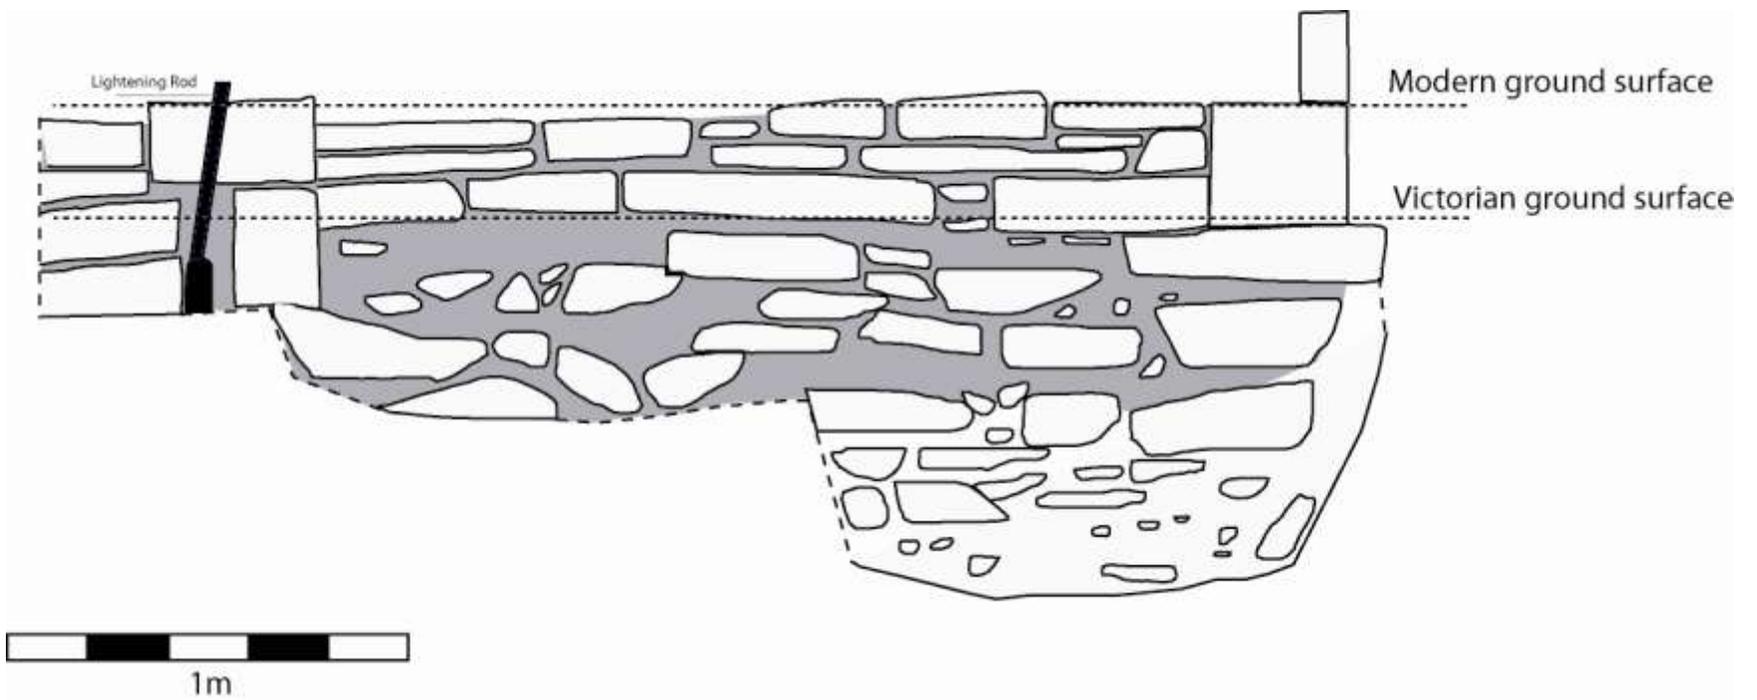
Elevation of south wall of excavation trench showing foundation of porch.
